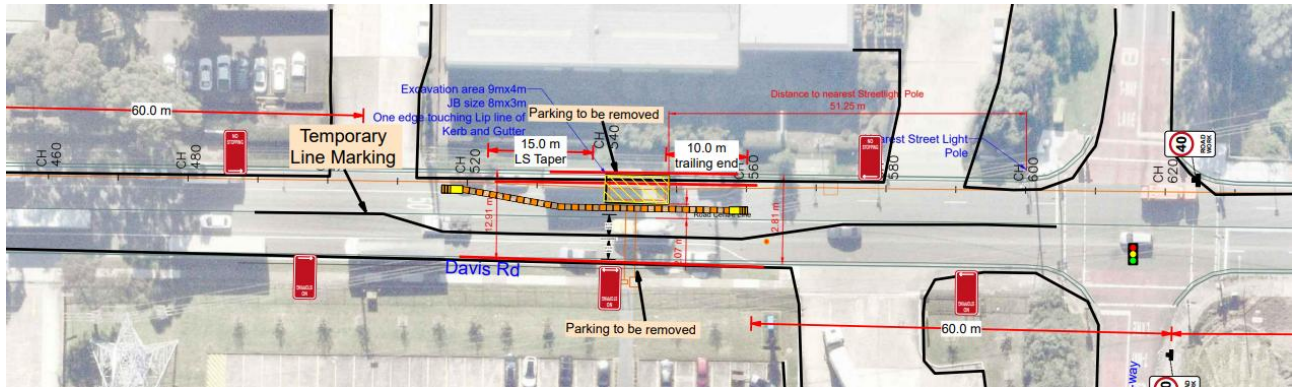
Proposed temporary traffic layout at Davis Road (Stage 2).
